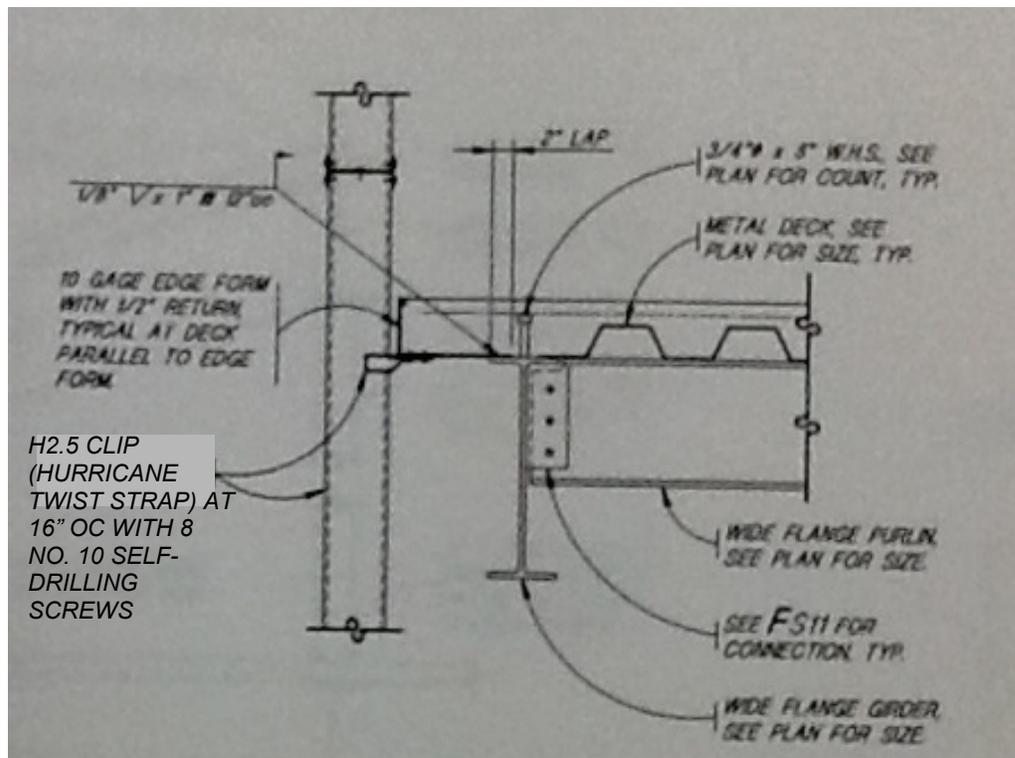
Detail from original drawings showing connection of exterior wall to each floor.
